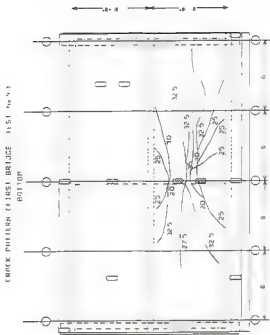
Bottom Cracking Pattern (First Bridge - Test No 4)
